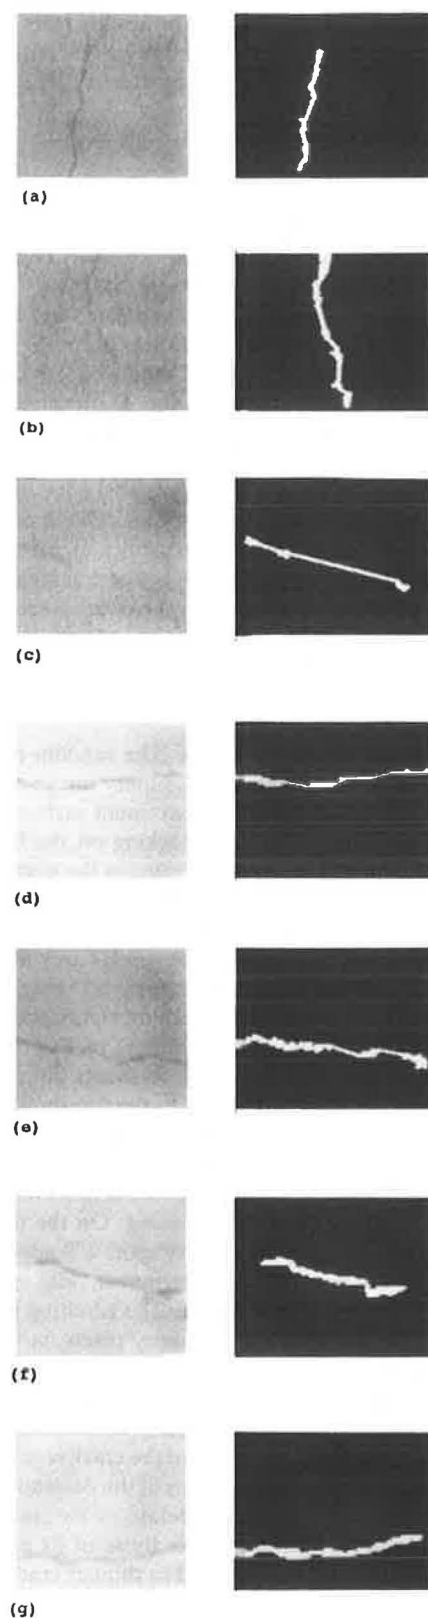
Examples in asphalt: (a), (b) longitudinal cracks, and (c) transverse crack. Examples in concrete: (d) transverse crack, (e)–(g) spalled cracks.
